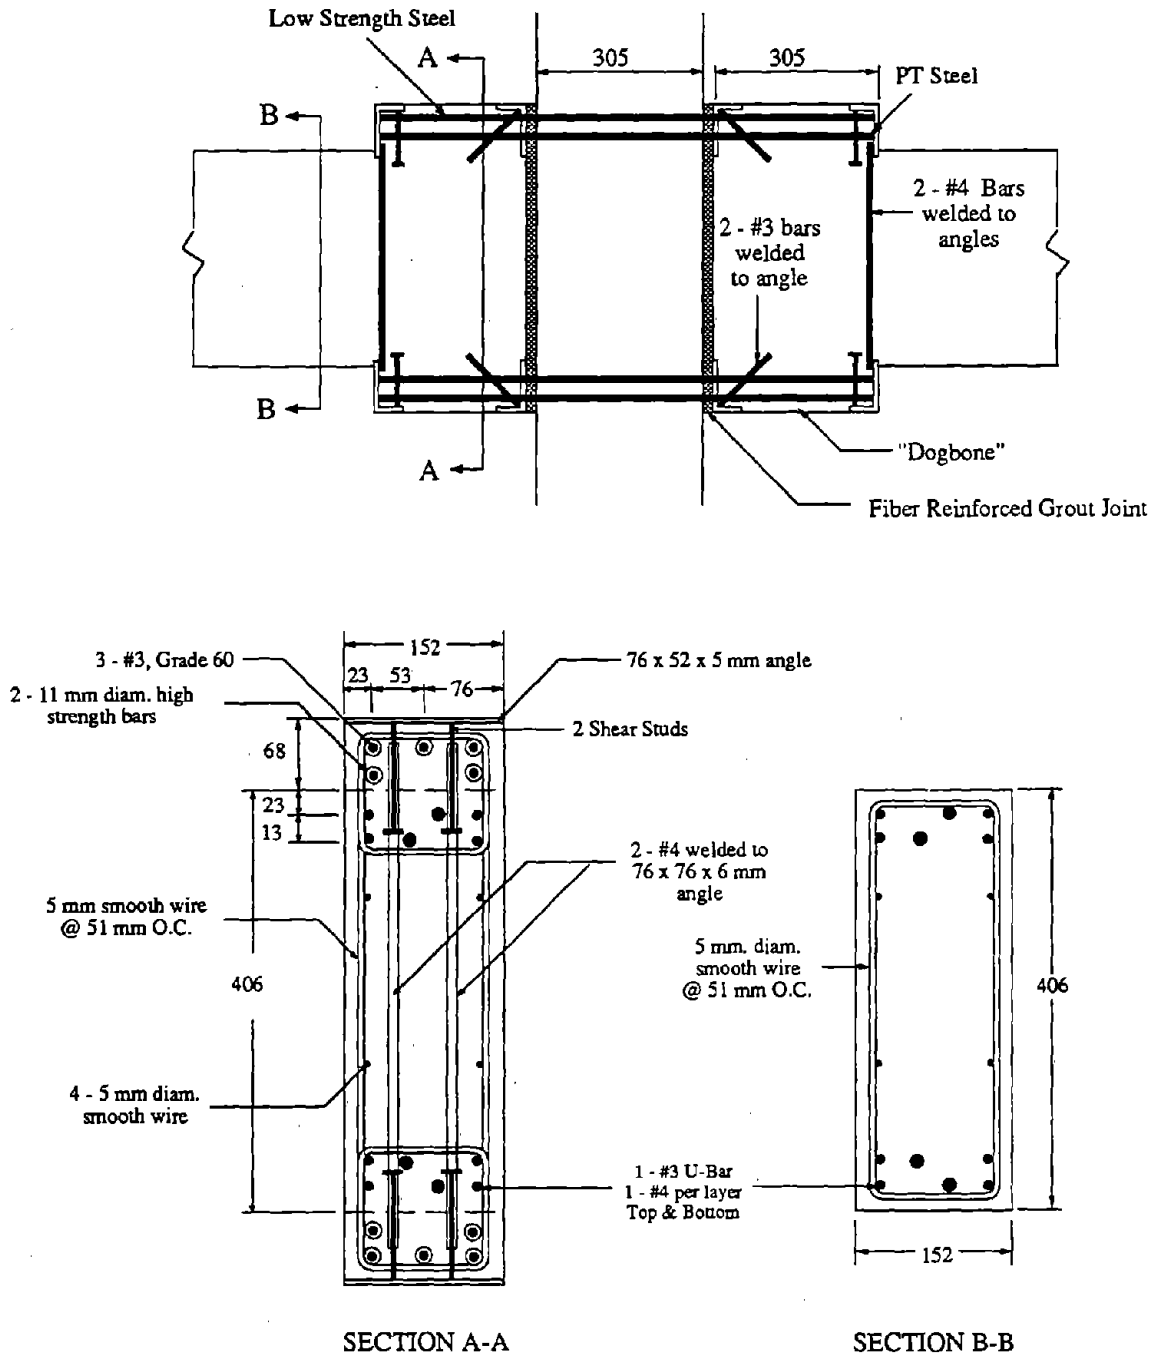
Model Beam Cross Sections for Phase IV A Specimen J-P-Z4.
